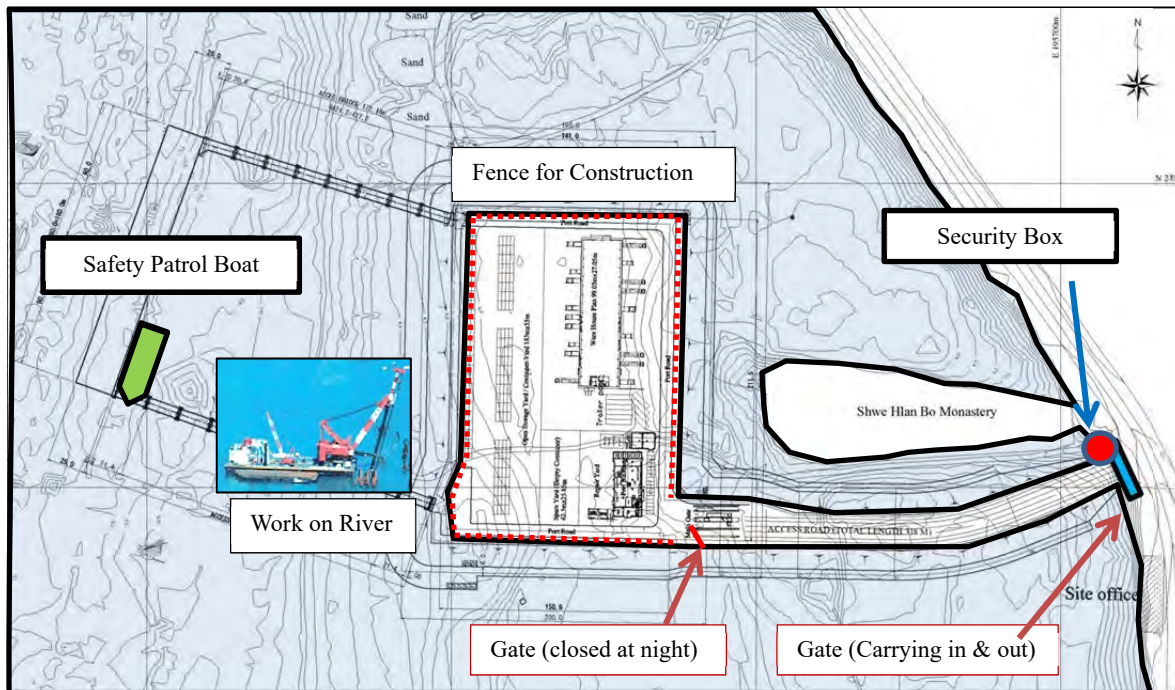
Facility Plan for Safety Measures (Rainy Season)
